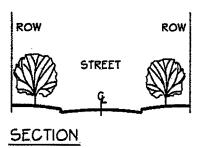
• INTERIOR STREET BOULEVARD STREETSCAPING
